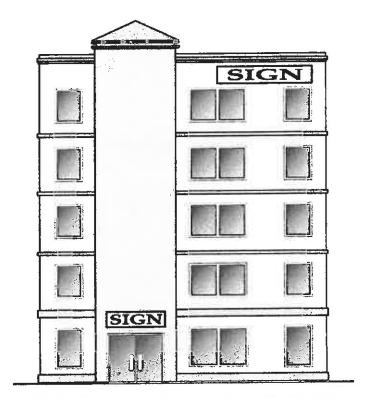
A-2: ALLOWED WALL SIGN LOCATIONS ON MULTIPLE-STORY BUILDINGS GREATER THAN THREE STORIES
